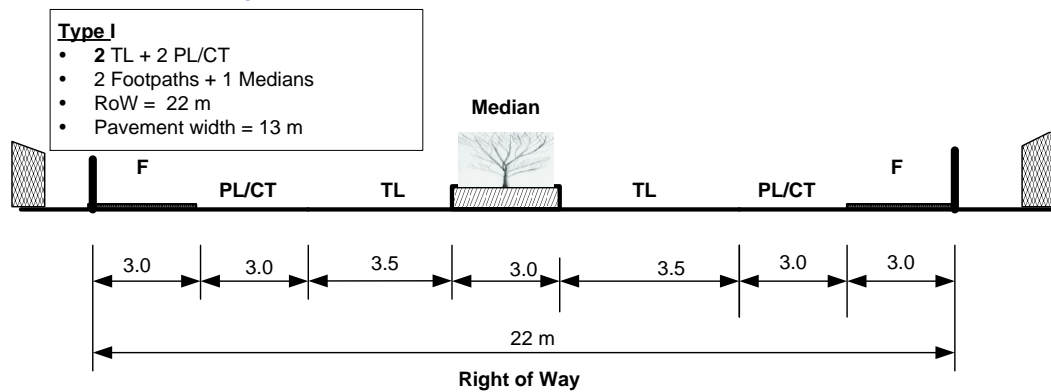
, Typical Cross-section for DCRN Roads (with RoW 22m)
